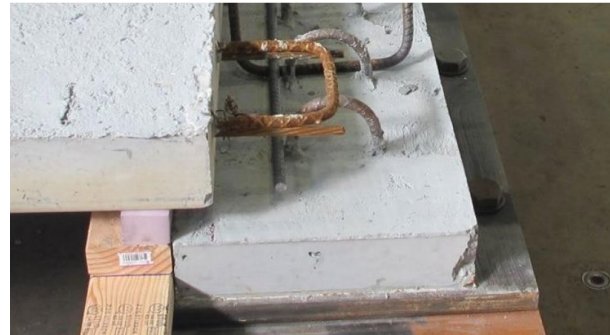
Push-off Specimen with Grouted Haunch (Scholz et al. 2007)
